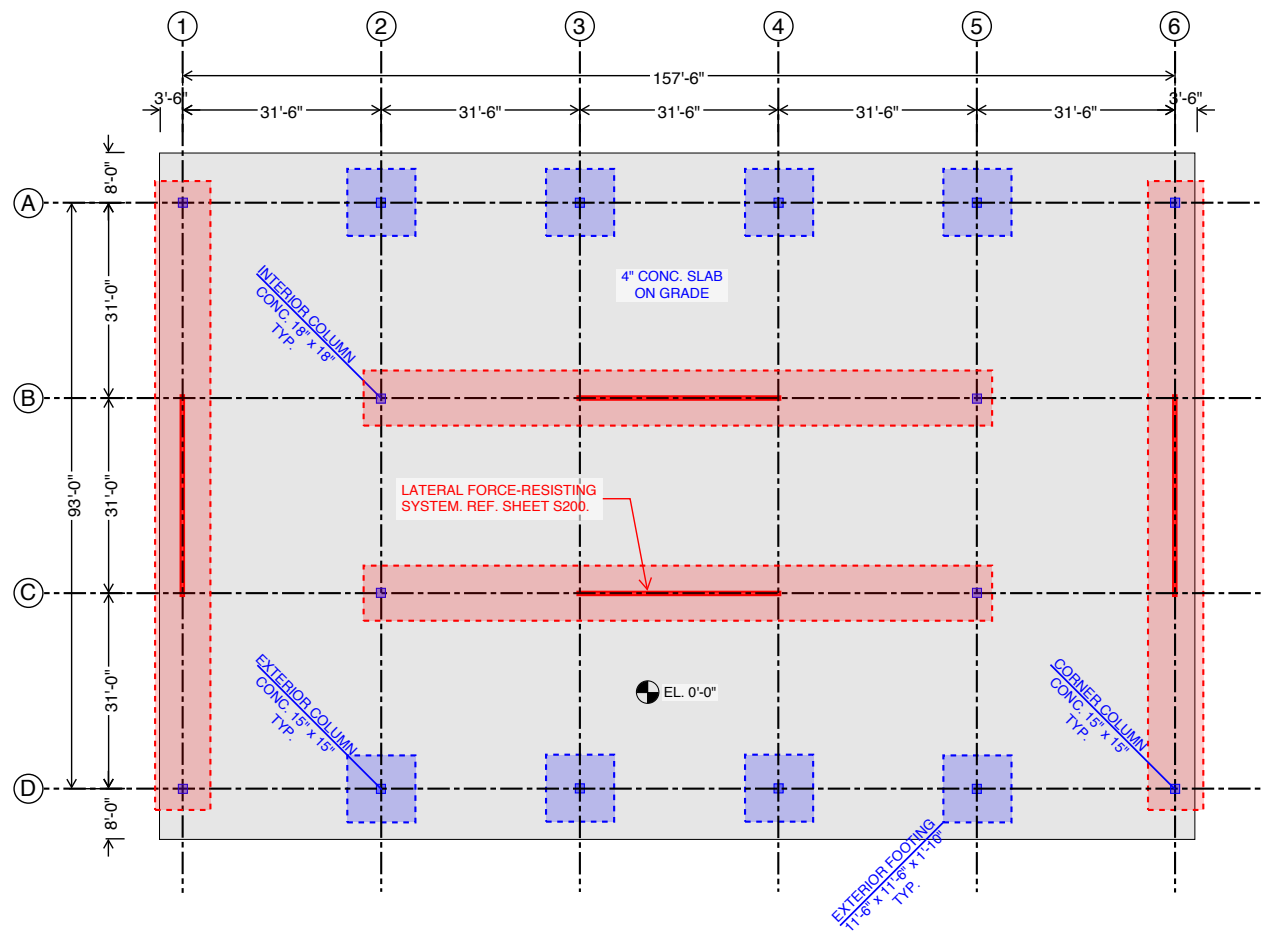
First floor and foundation plan for the medium reinforced concrete office building
